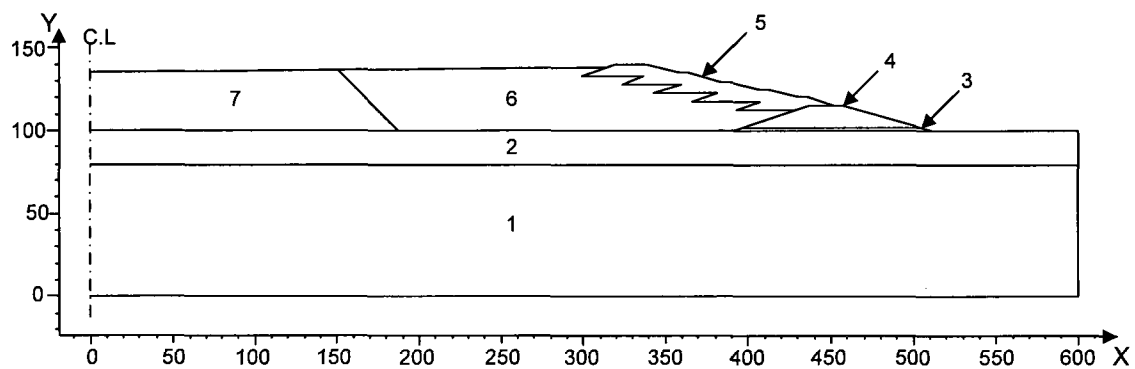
The geometry of the typical UTDF analysis section considering the components and internal zoning proposed in section 4.1: 1- bedrock foundation, 2-glacial till layer dominated by clayey materials, 3-drainage layer, 4-starter dyke, 5- embankment dykes, 6- beached (initial) tailings 7- slime tailings
